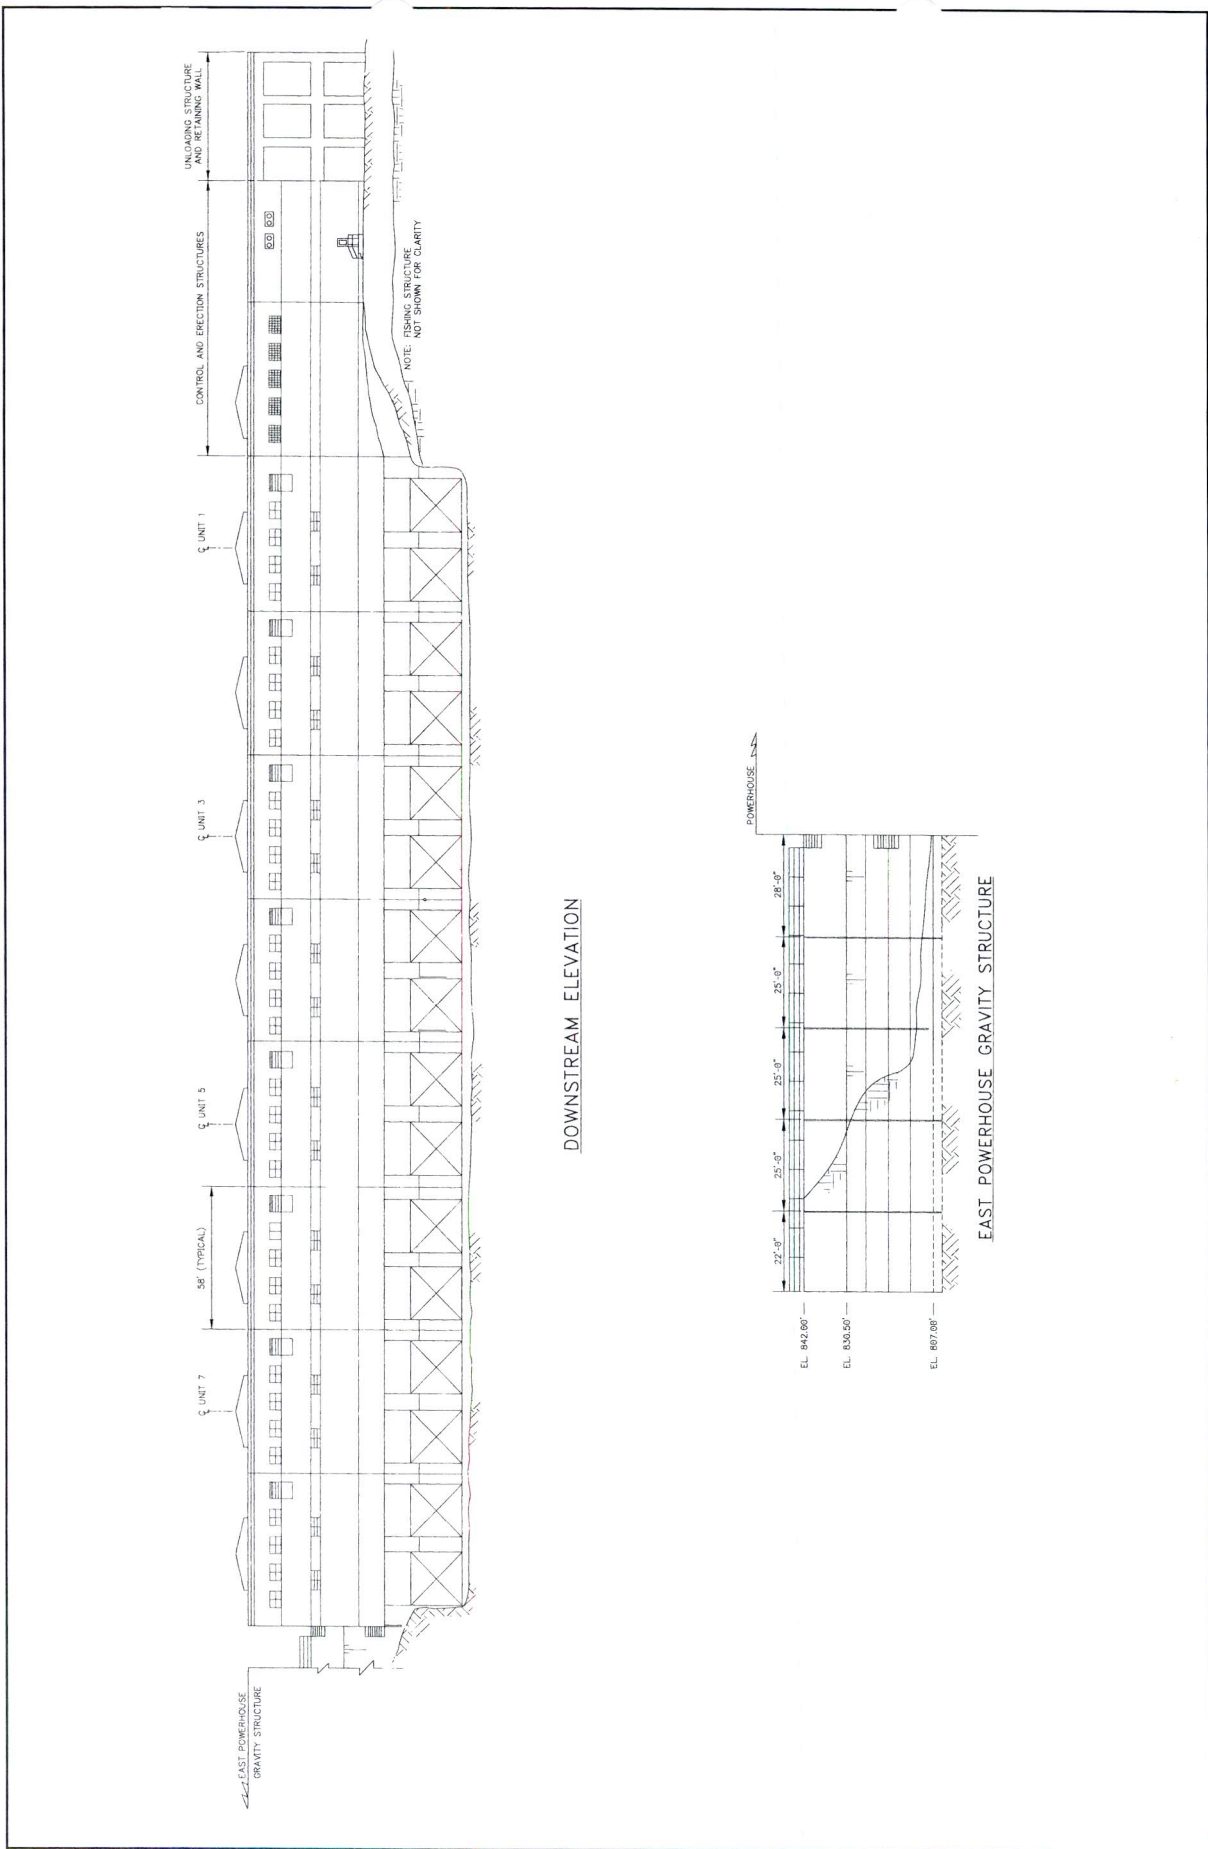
Powerhouse and East Powerhouse Gravity Structure - Downstream Elevation
